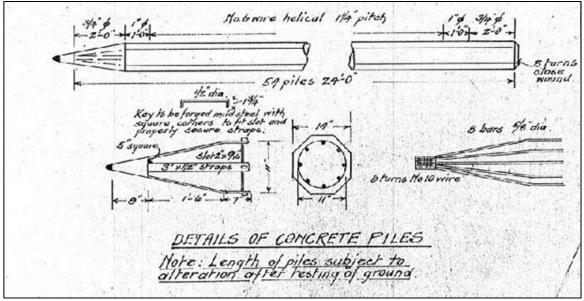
Pile details of Pages Rd. Bridge taken from original bridge drawings
